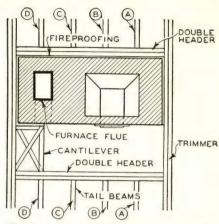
Joist Framing Details around Fireplace Chimney Shown in Fig. 3
